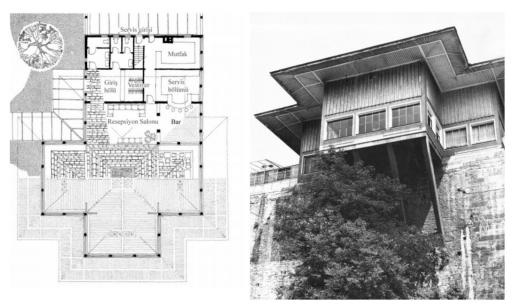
Taşlık kir Kahvesi as an Overhanging flat roof example- (Source: Erarslan, 2020)
